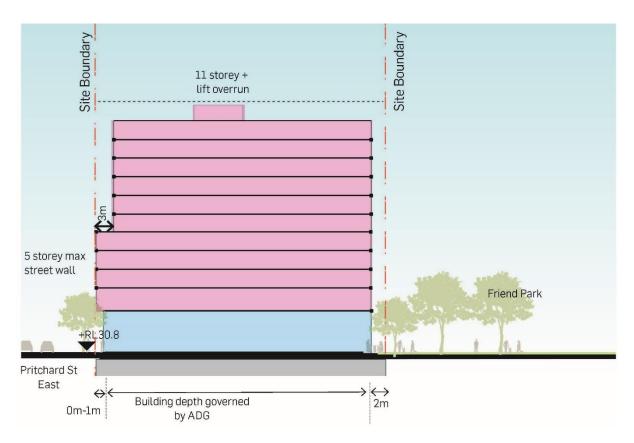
Figure H: Section D-D through Corner of Pritchard Street and Station Street Precinct – typical north-south tower section
